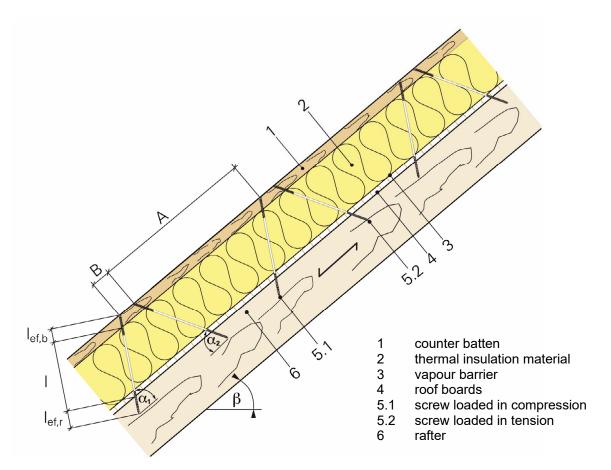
Fastening of thermal insulation material on top of rafters – Structural system for alternatively inclined screws and continuous counter batten under constant line loads from actions on the roof plane  $q\perp$  and concentrated loads from tensile screws  $F_{ZS}$
